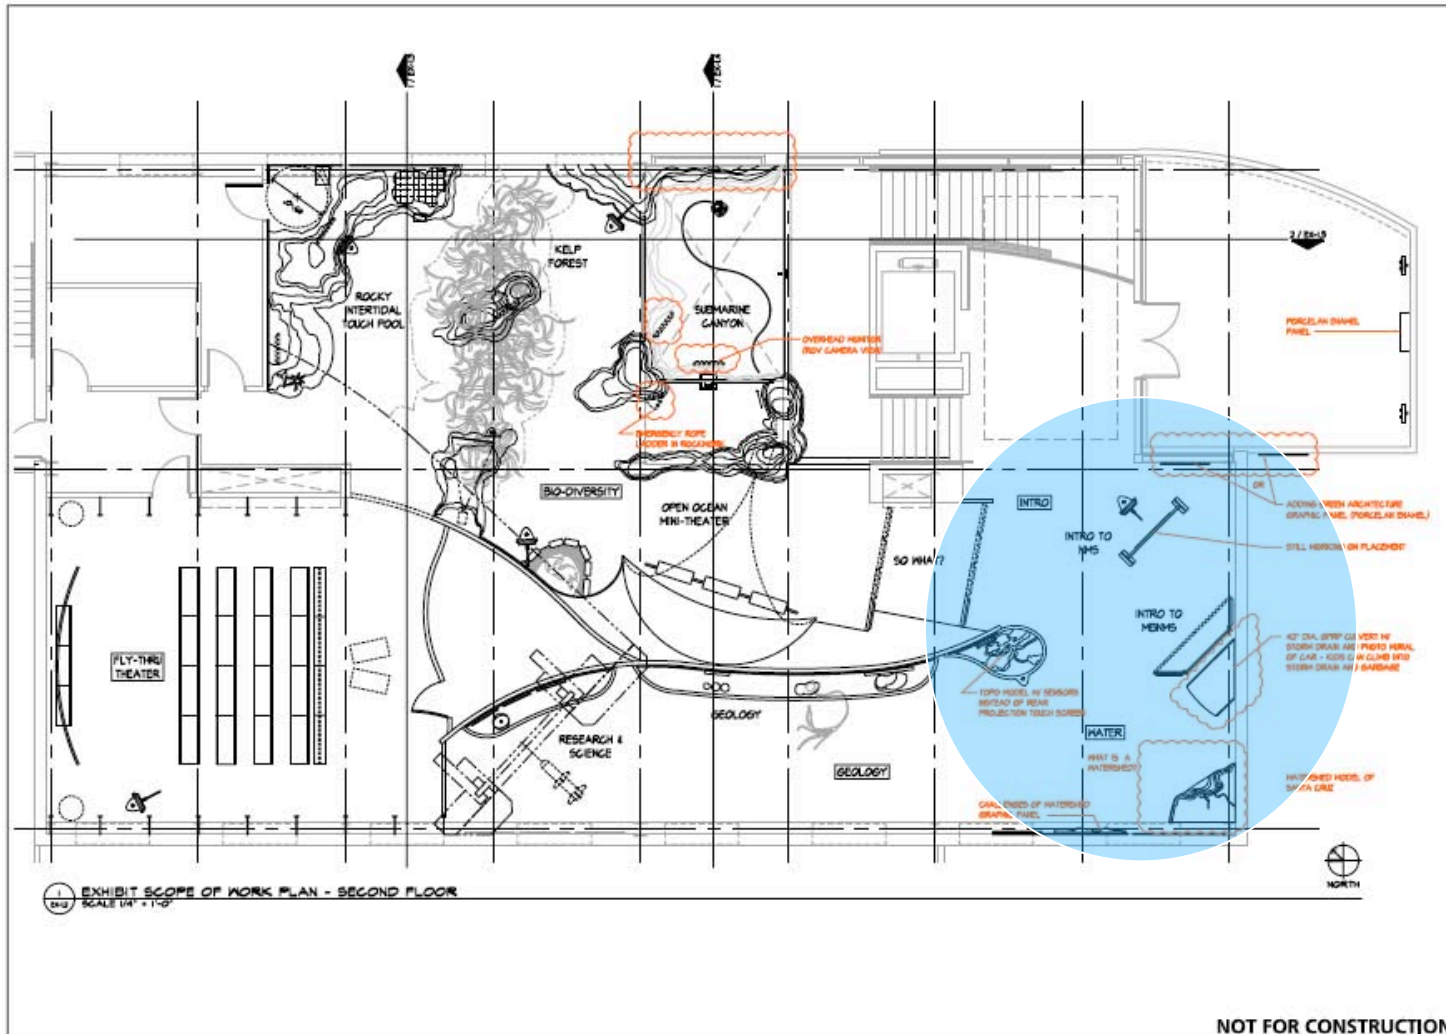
EXHIBIT SCOPE OF WORK PLAN - SECOND FLOOR
